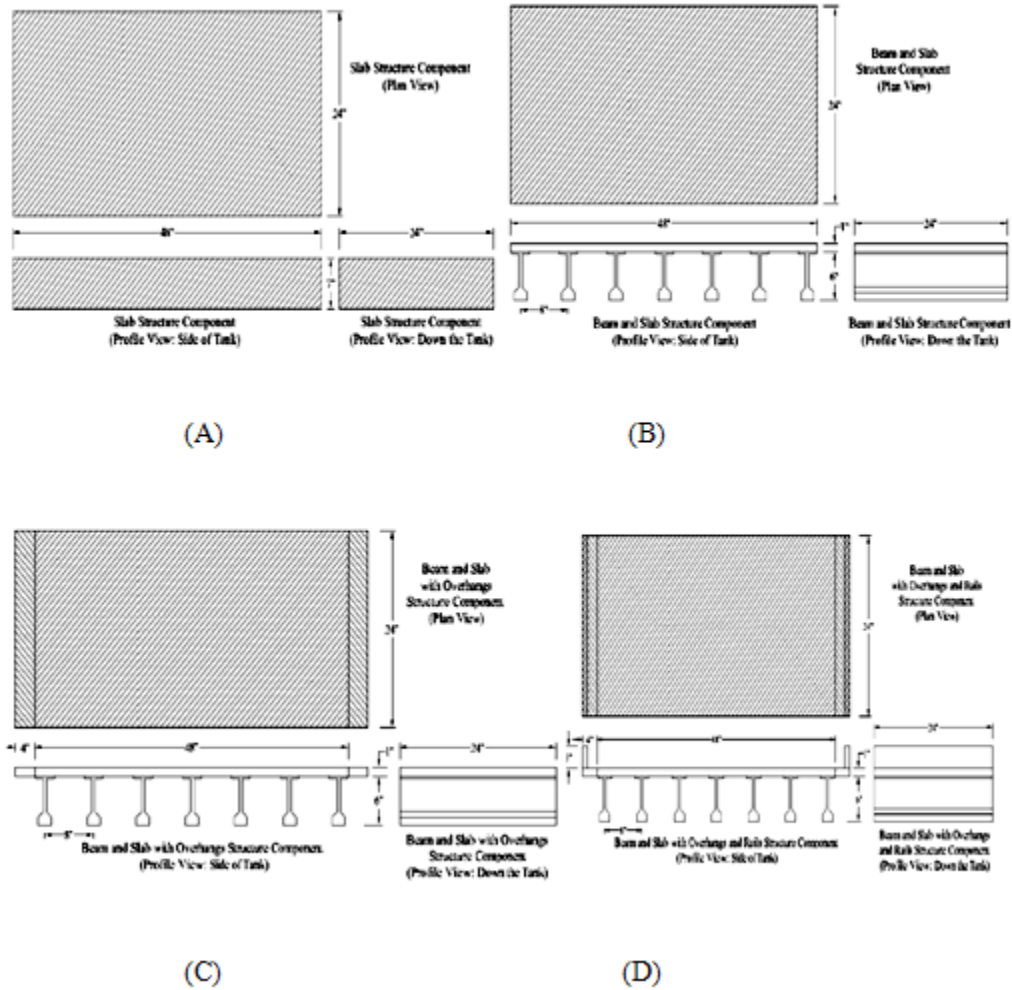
Bridge Deck Models used in Wave Tank Testing (Sheppard, 2009)
